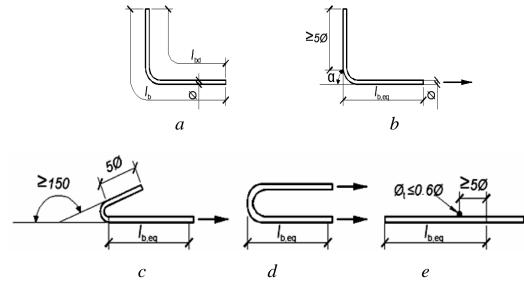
Methods for indirect anchoring bars: a – anchoring base length l_b for any form along the axis; b – the anchoring equivalent length for standard bend bar; c – the anchoring equivalent length for standard hook; d – the anchoring equivalent length for standard loop; e – the anchoring equivalent length for welded bar
